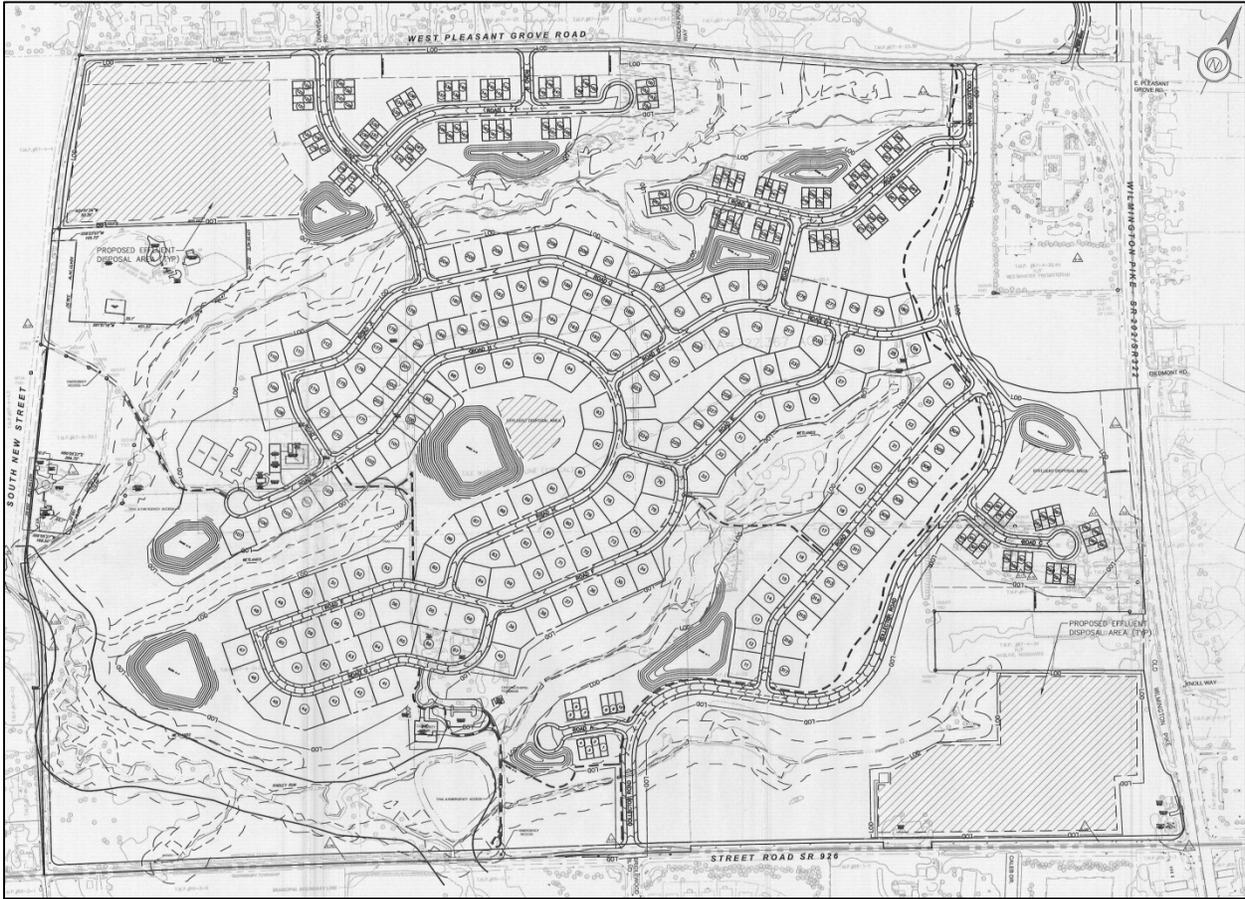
Site Plan Detail, Sheet 12, Conditional Use Application, The Robinson Tract
